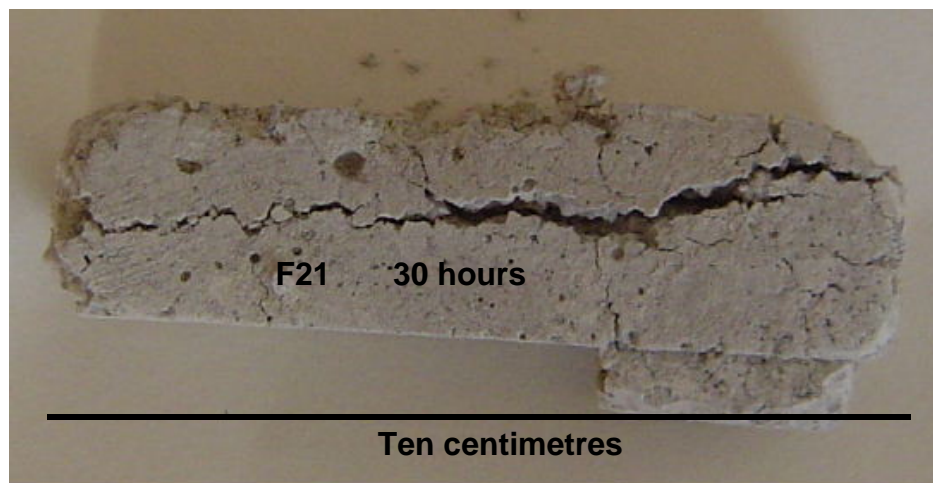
The naked test bar (F21) with enlarged surface cracks opening after 30 hours.
